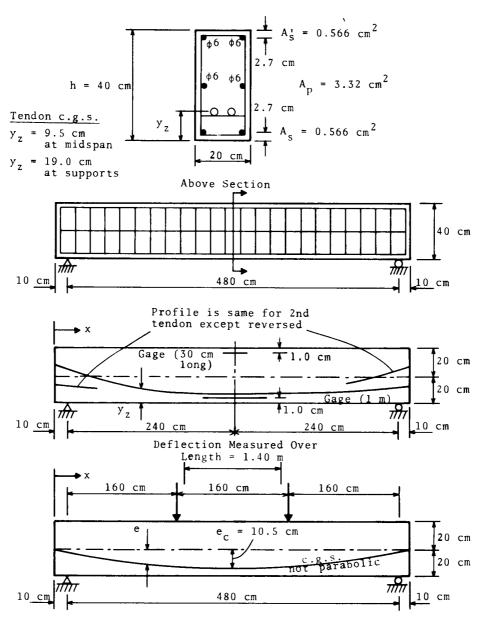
Beam 5 [bonded prestressed, draped tendons (not parabolic)]
